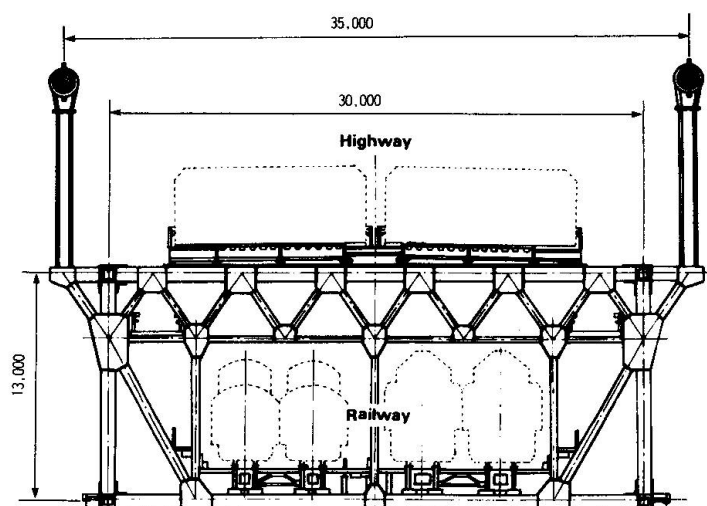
Cross-Section of suspension bridge (Kojima-Sakaide Route)
